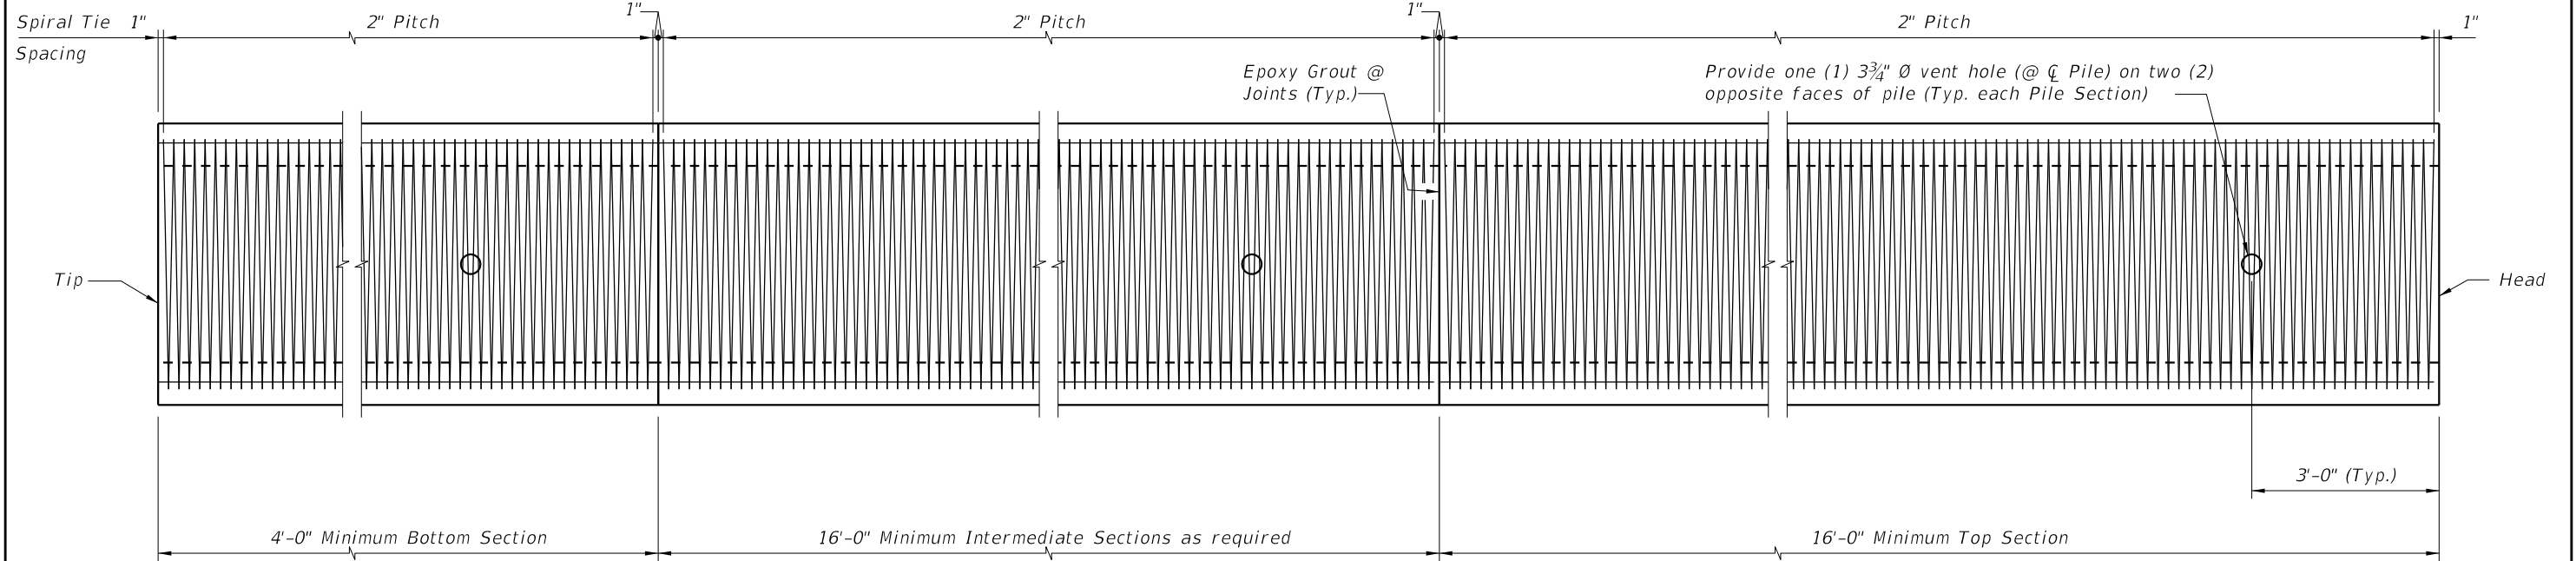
DETAIL OF PILE COLLAR FOR HIGH MOMENT CAPACITY 30" SQUARE PRESTRESSED PILE - PILE SPLICE DETAIL-
